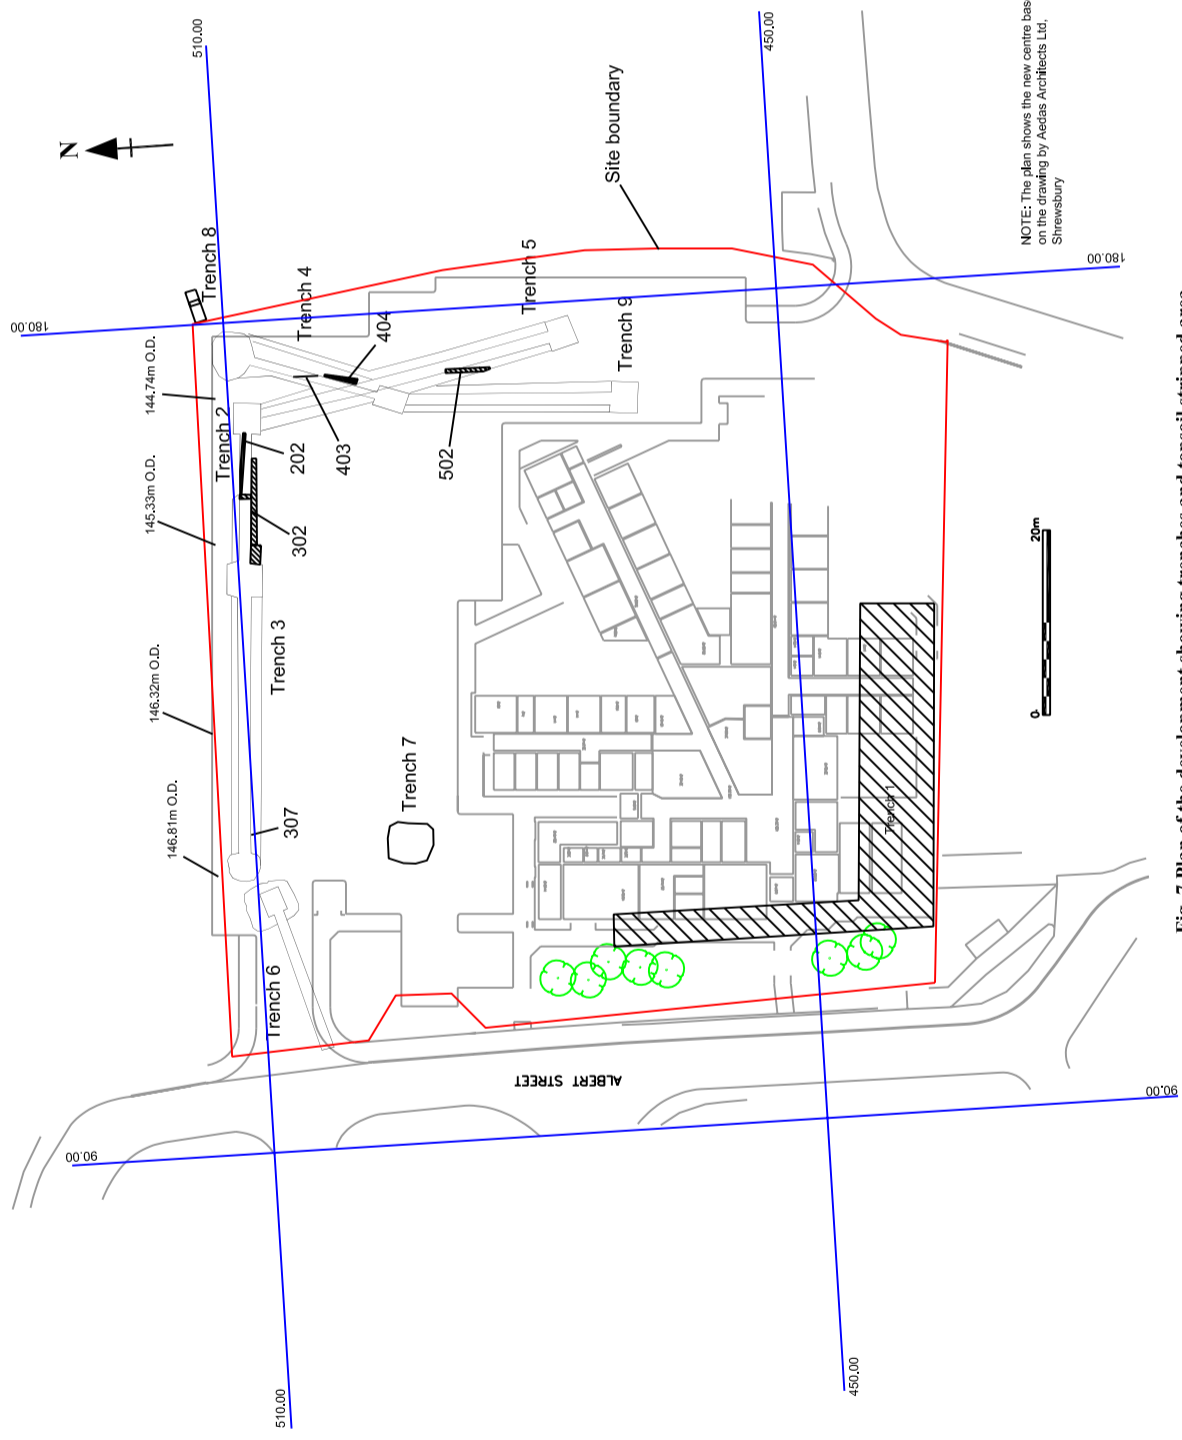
Plan of the development showing trenches and topsoil stripped area
